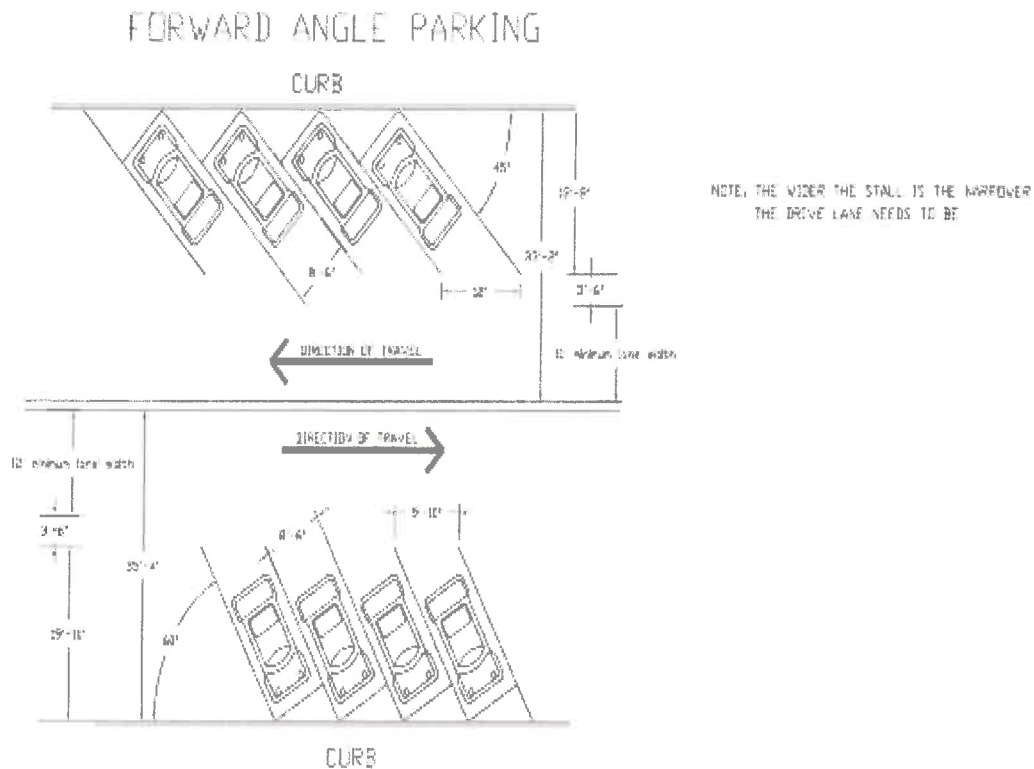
Example of 45° and 60° Angle Parking Pavement Marking Layout (KCMO Traffic Engineering and Operations Manual)
